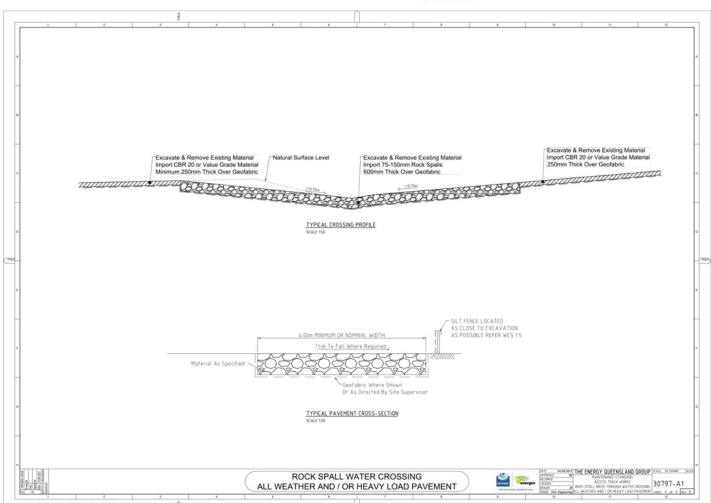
Access Track Infrastructure - Minor Creek Crossing - Rock Spall Water Course Crossing
